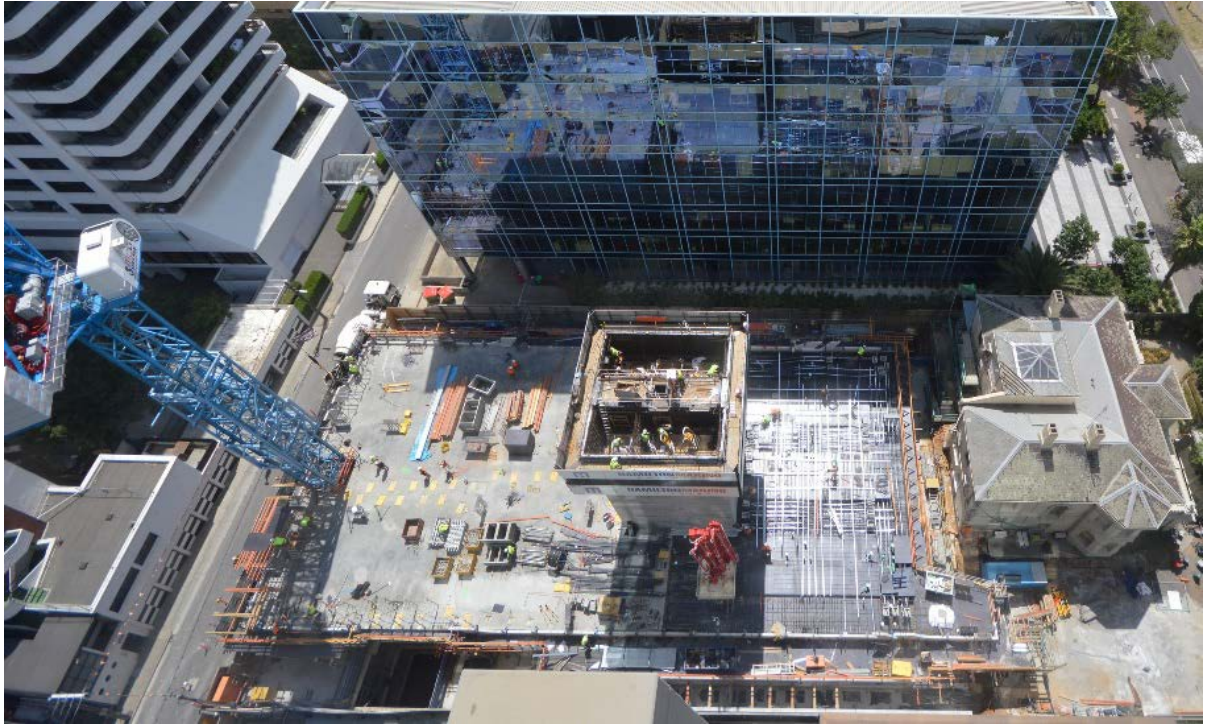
View from top – Constructing Lift Core & Level 1 slab
